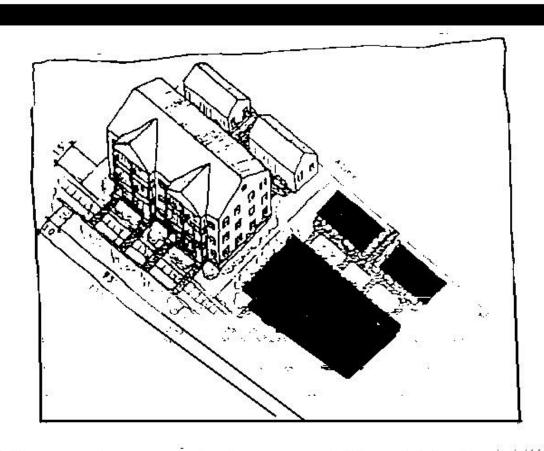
Figure ground and axonometric of an appartment building on 110 foot deep lot. The building contains 9 units. There are garage spaces for one car per unit.
